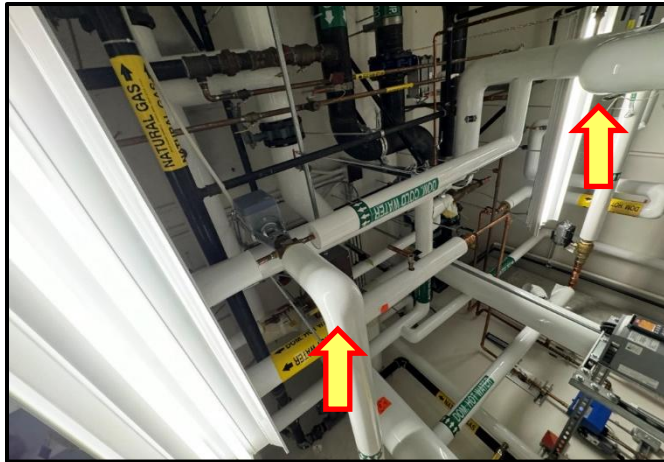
View of non-asbestos fiberglass insulation observed in ceiling spaces throughout the building.
